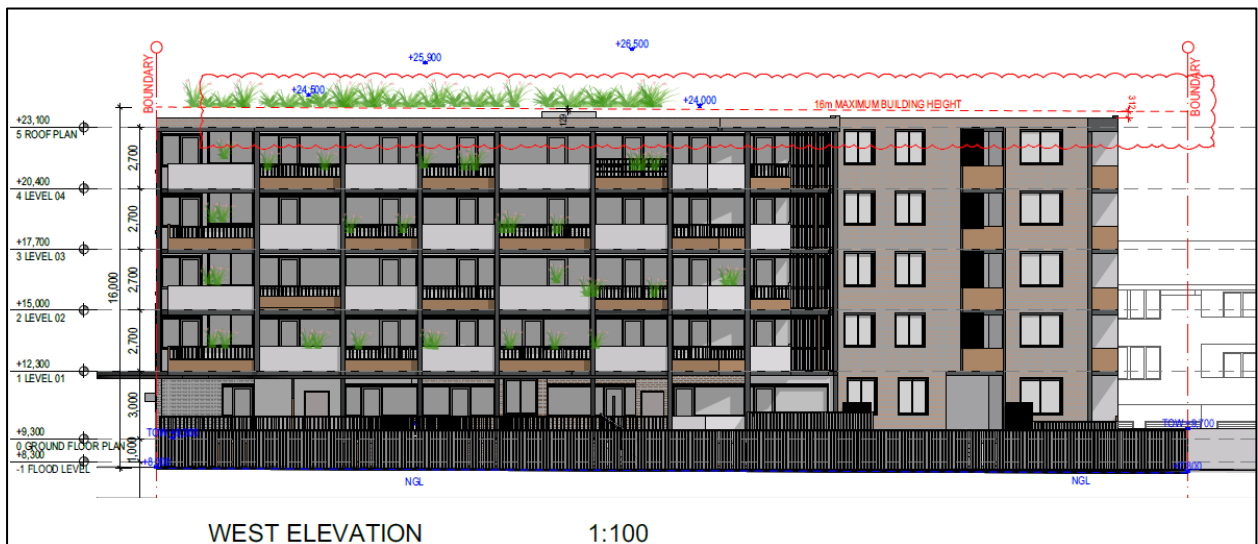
Approved West Elevation – DA 2018/67/1 (dated 1 March 2019)
